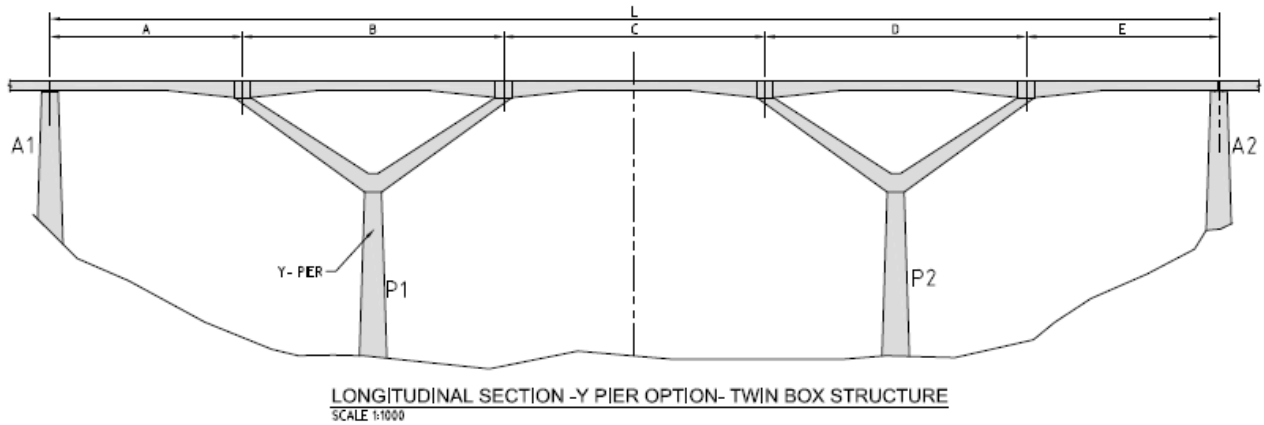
Longitudinal Section- Y Pier Option – Twin Box Structure
